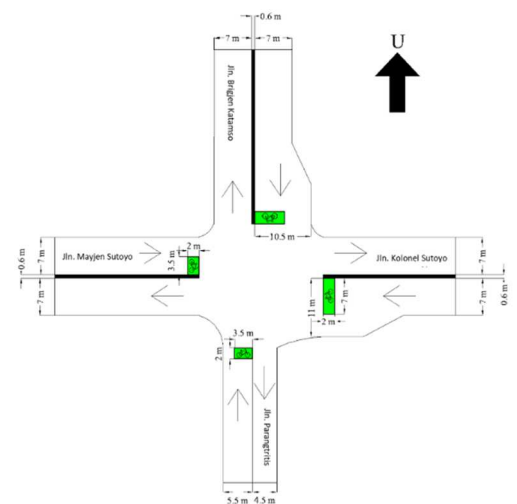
Layout of Pojok Benteng Wetan Intersection
